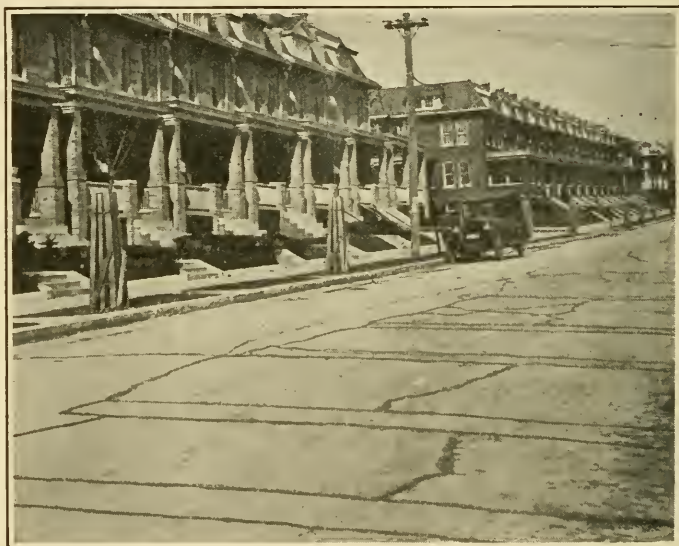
This picture illustrates that a concrete pavement can be successfully patched, leaving the roadway as smooth for travel as when first laid. The joints about the patches have been treated with a bituminous cement and sand.
